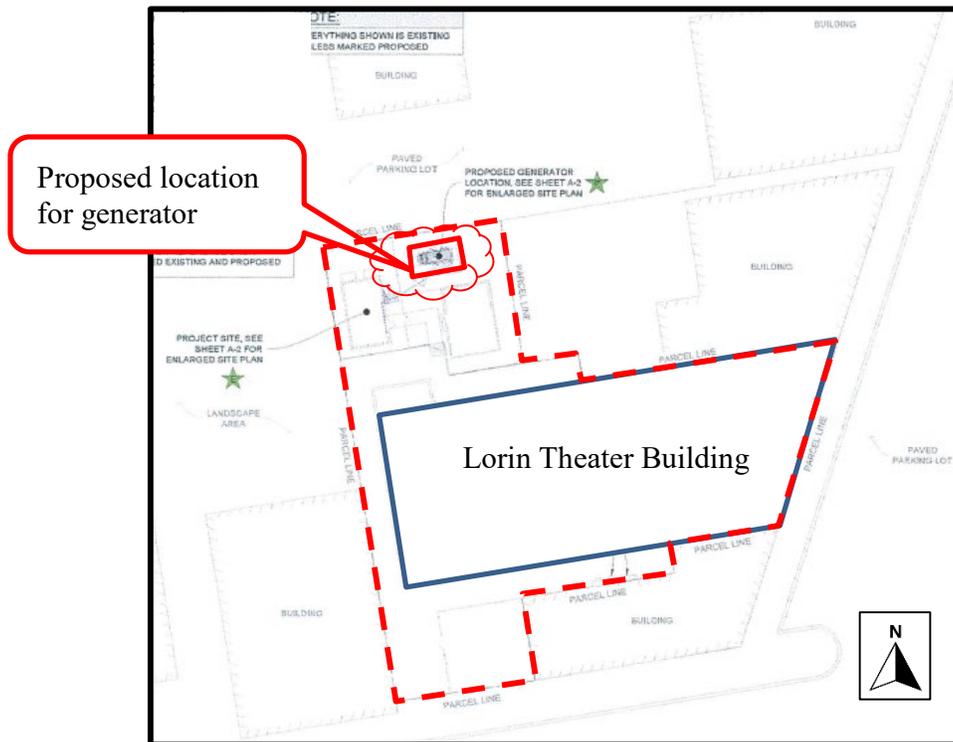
Site Plan (Attachment 2 - Project Plans, Sheet A-1)
